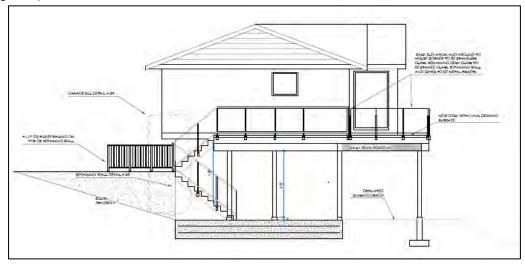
Side view of the building and proposed deck expansion. Drawings provided by Momentum Design Build.
